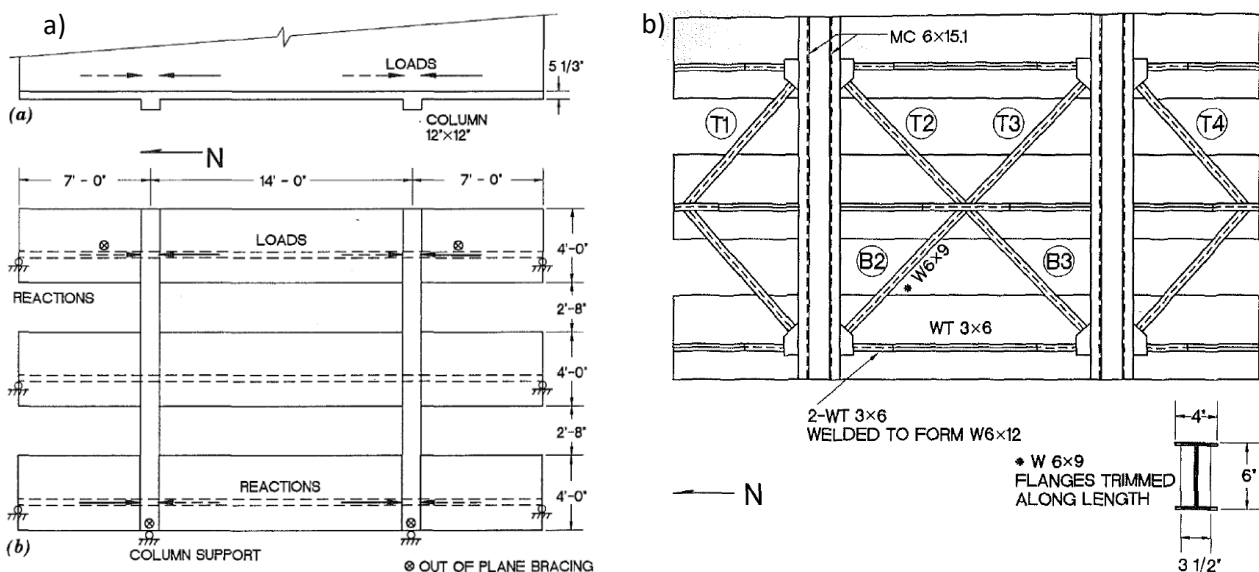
a) Scheme of the two-thirds-scale frame specimen, above the plan and below the elevation; b) Scheme of the bracing system – Source: [108]
